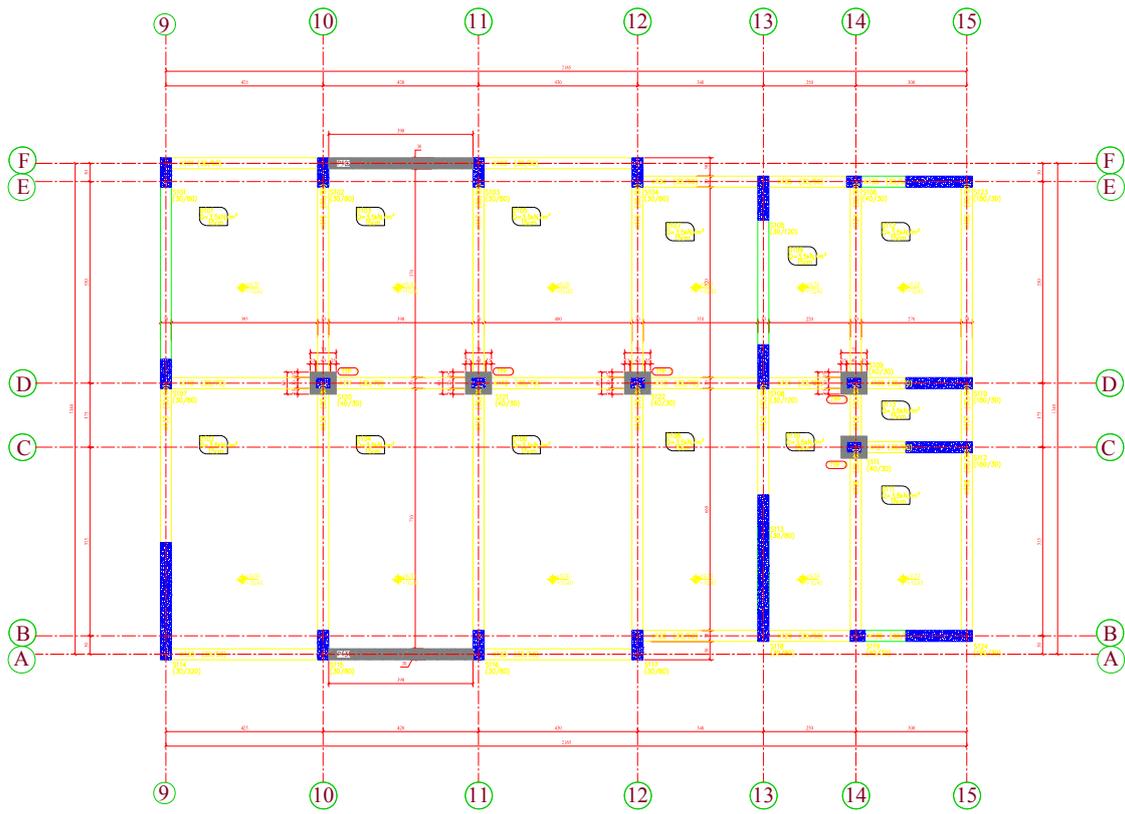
Strengthening of Kazim Karabekir gymnasium hostel B block in Van by adding shear walls and jacking of columns
